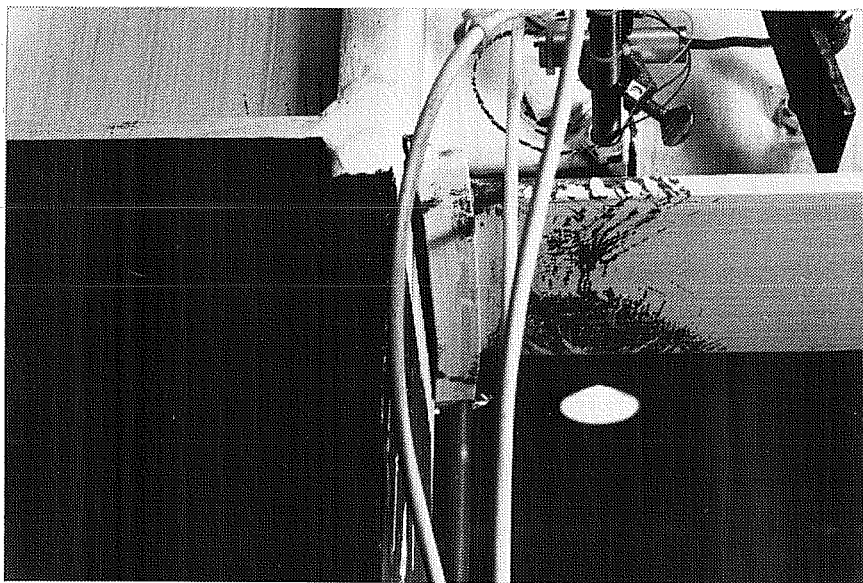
Bottom Flange Failure in Specimen 2
